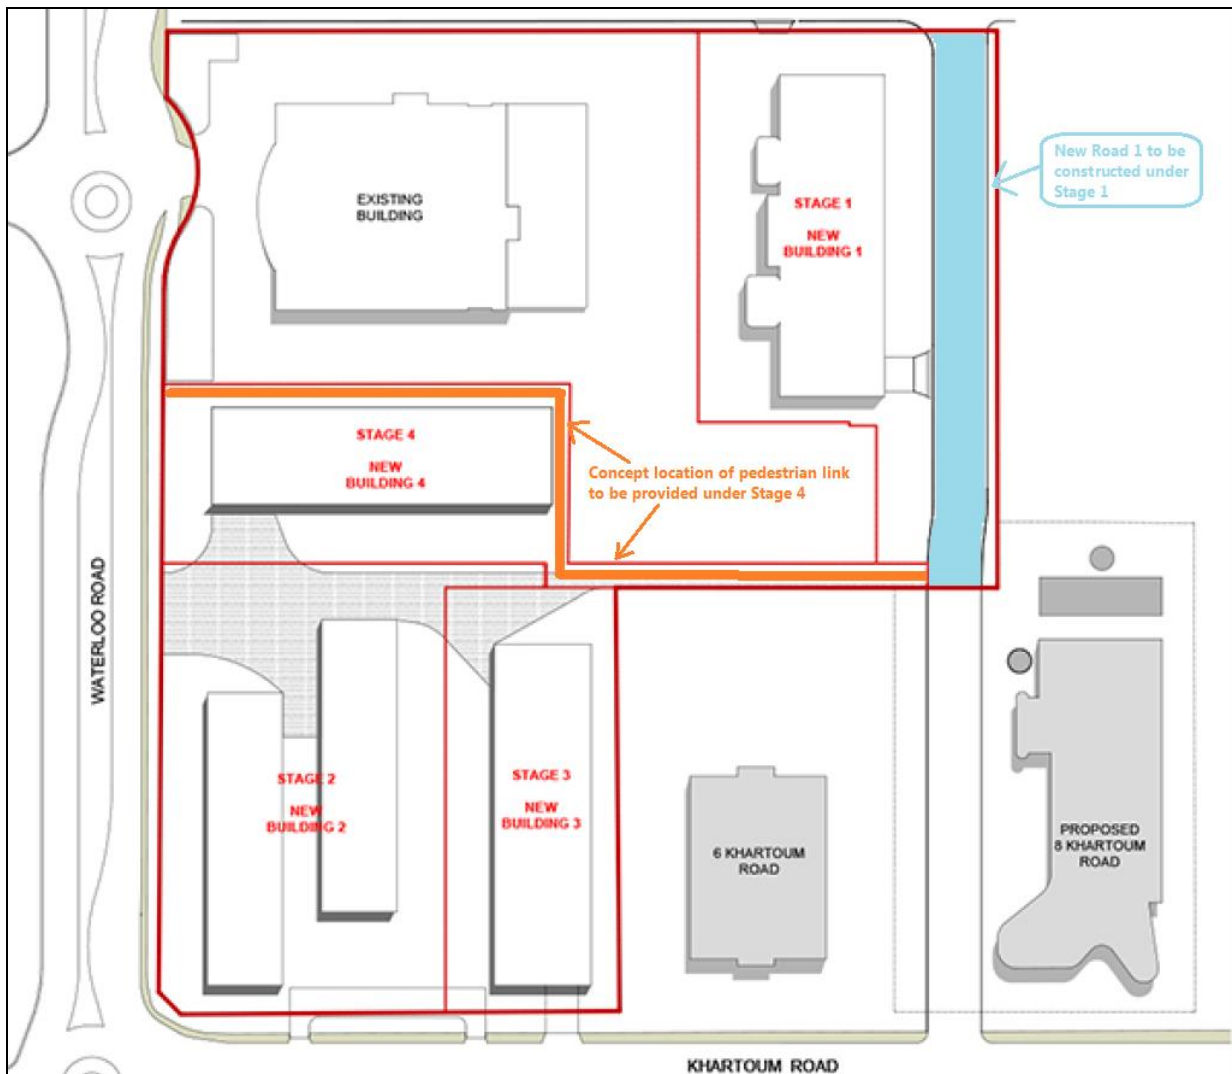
Concept DA Staging Plan identifying new road and pedestrian link
